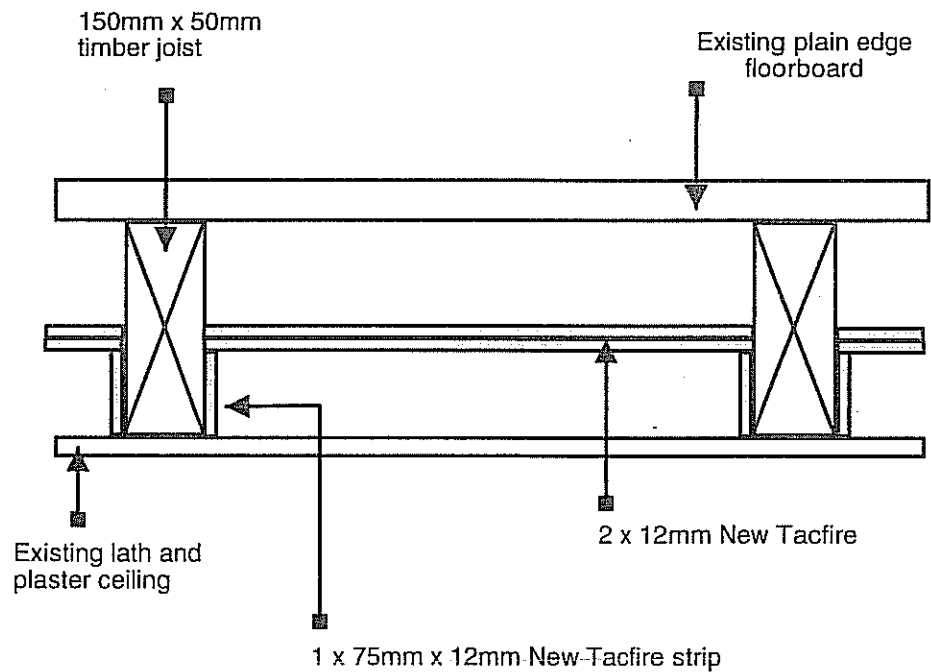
Use of New Tacfire above an existing ceiling to provide 60 minutes fire resistance
